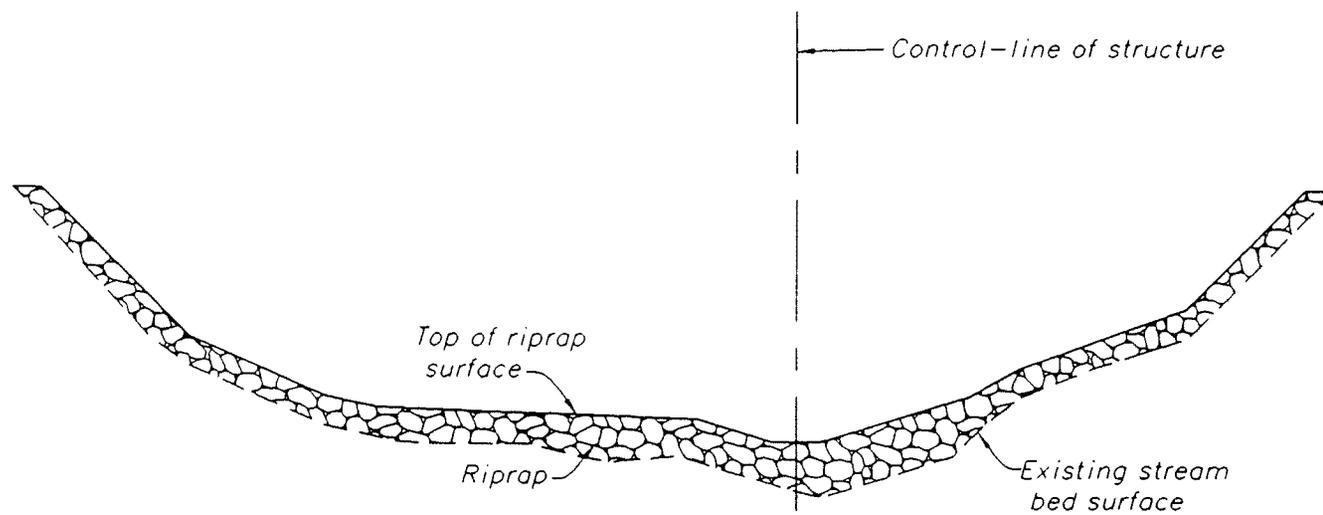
TYPICAL SECTION - GRADIENT CONTROL STRUCTURE (Looking Downstream)
